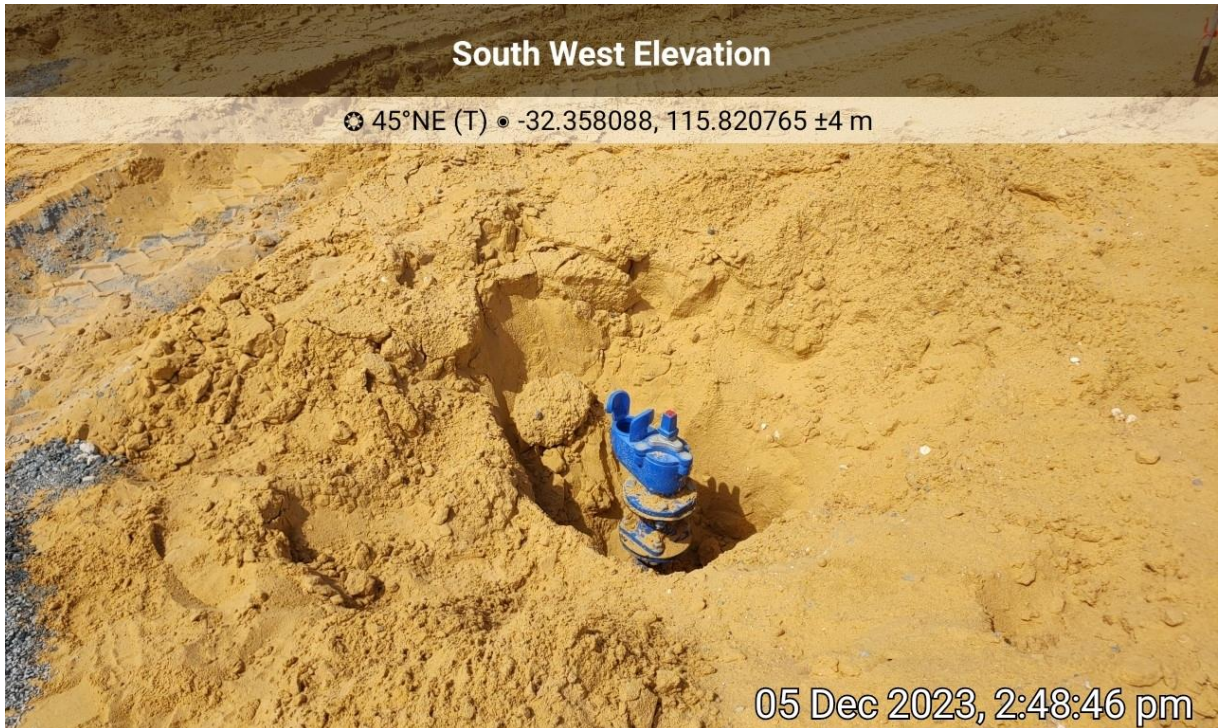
Evidence of installation of hydrants within the site is underway in accordance with the Water Reticulation Plan.
